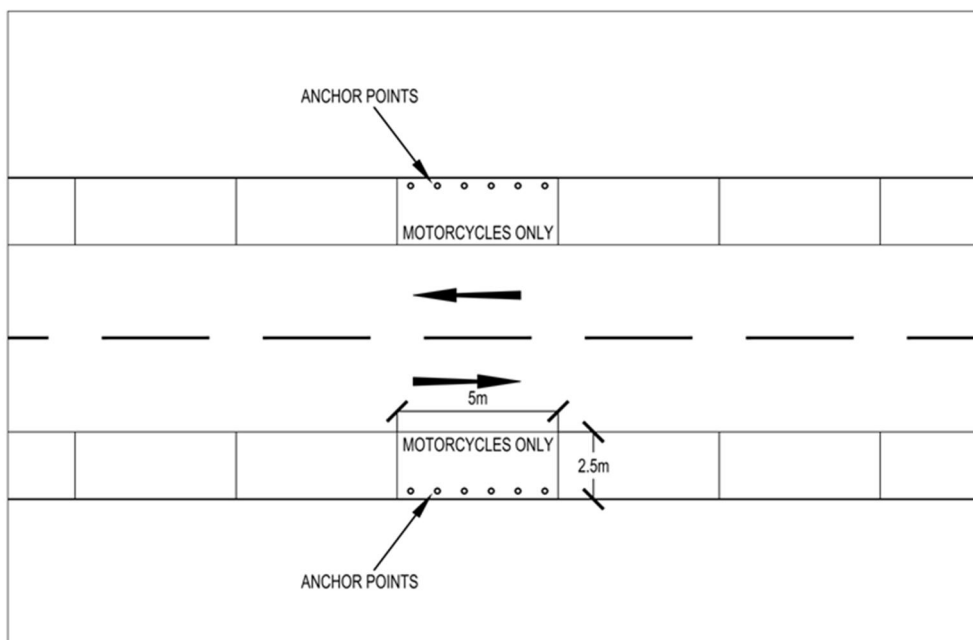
Motorcycle parking with surface mounted anchor points
